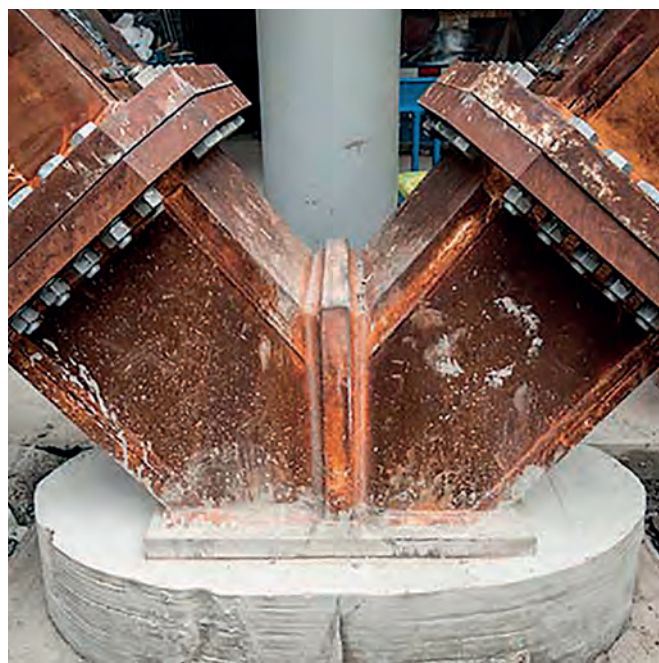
V-shaped columns connection to a 3 tonne node at ground level, prior to concrete encasement
